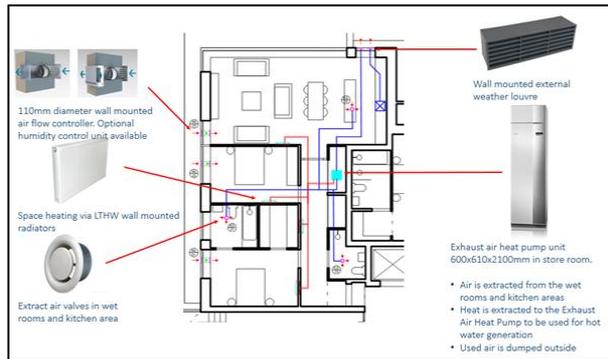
Example Diagram of Typical Exhaust Air Heat Pump Layout
